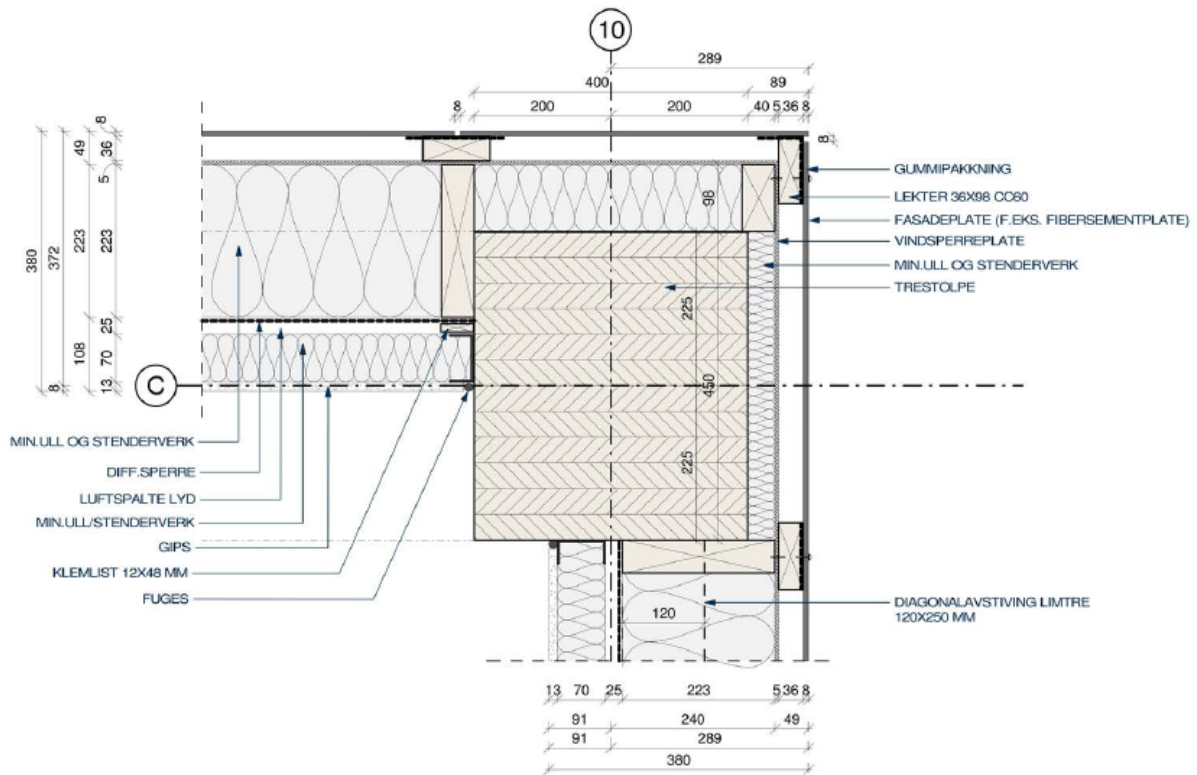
Illustration showing the wall build up for external walls(Løvseth, 2019).
